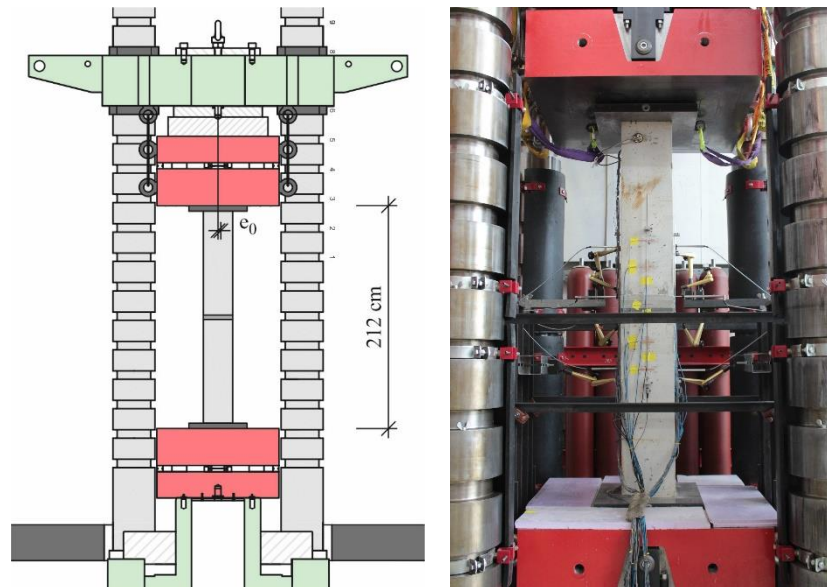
Experimental setup: schematic draft of 30 MN testing machine with butt-jointed column (left); installed large-scale test S 9.3 before testing (right)
